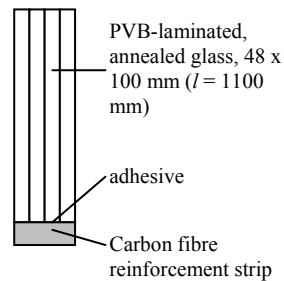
Section of the CFRP reinforced glass beams applied at the Loggia dei Vicari, Arquà Petrarca.
